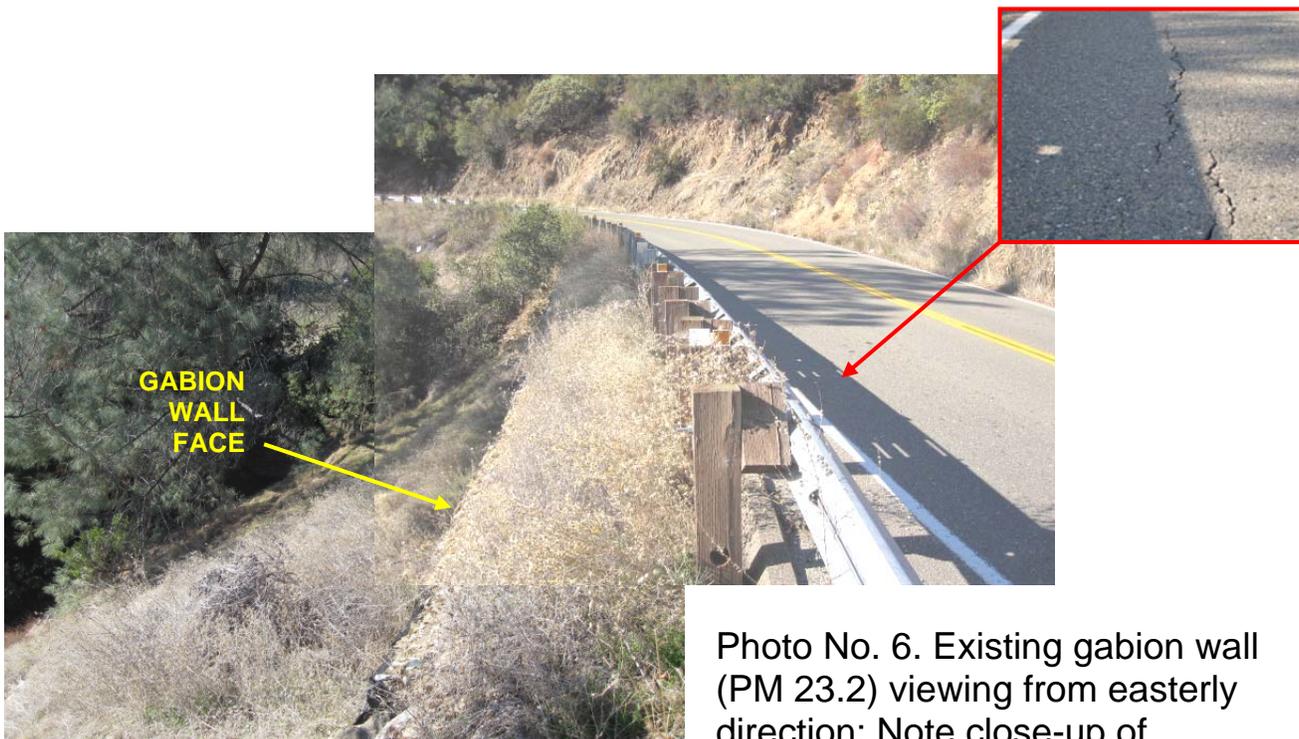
Existing gabion wall (PM 23.2) viewing from easterly direction; Note close-up of longitudinal pavement cracking (photo taken on 8-25-11).
